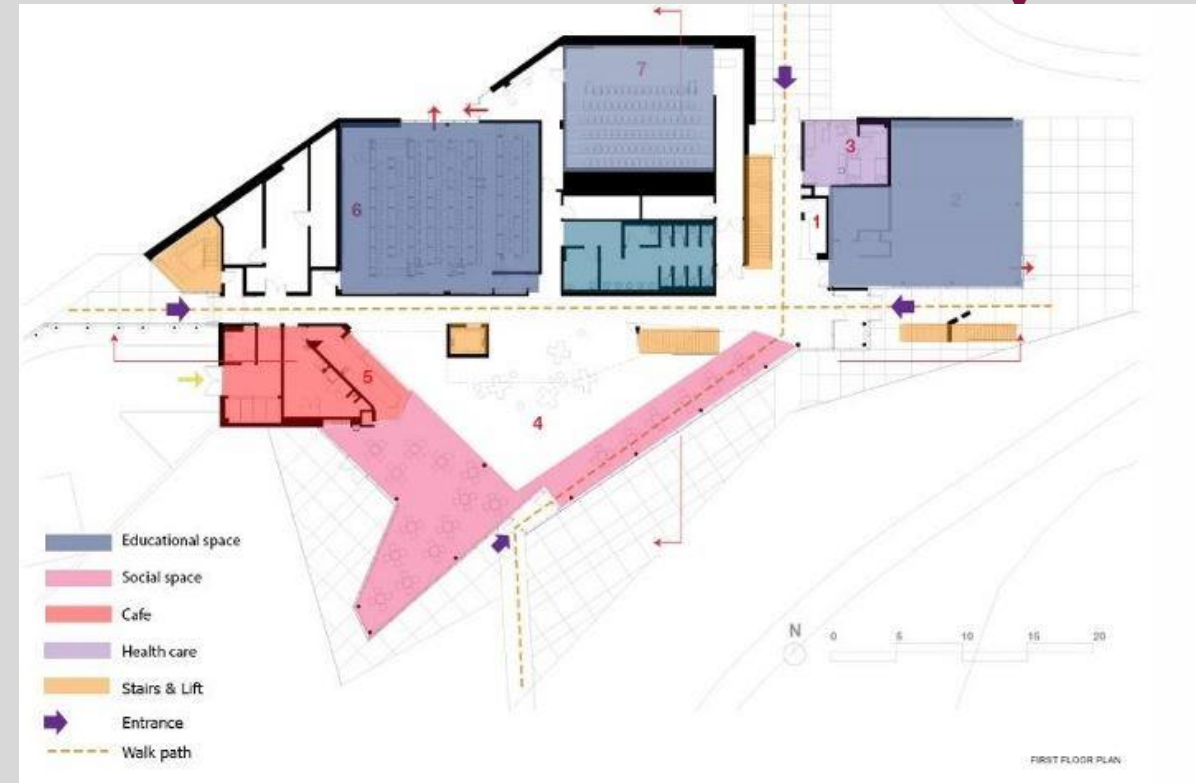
Existing Zoning of The Ground Floor of Trent University Student Centre (ArchDaily, 2018)
